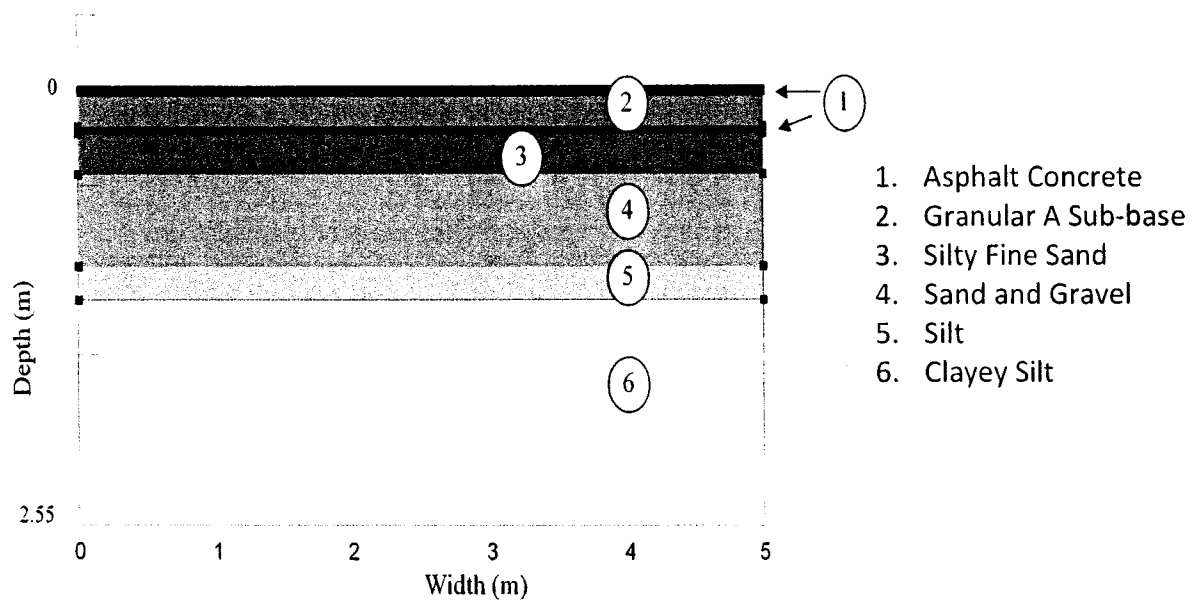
Highway 569 Study Site Roadway Cross Section
